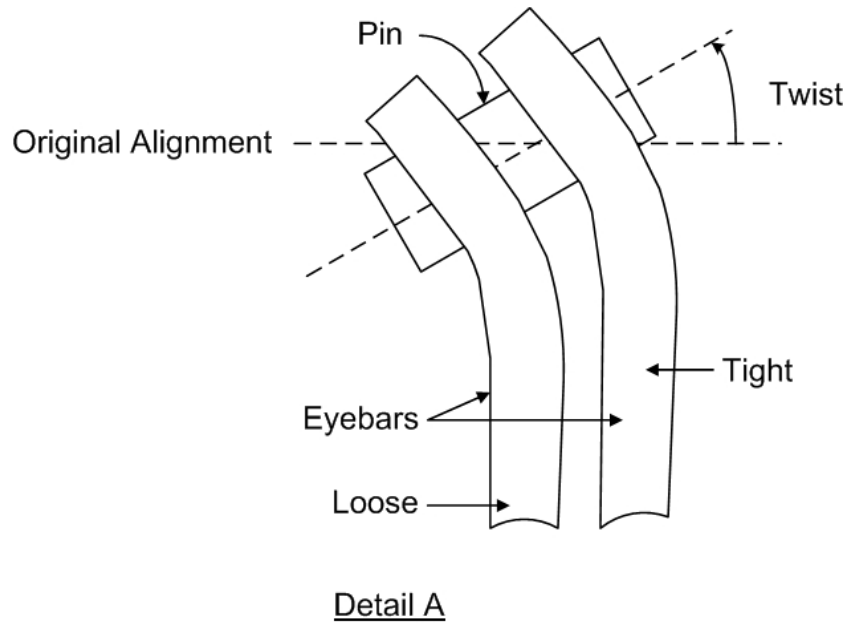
Detail A - Eyebar Member with Unequal Load Distribution
